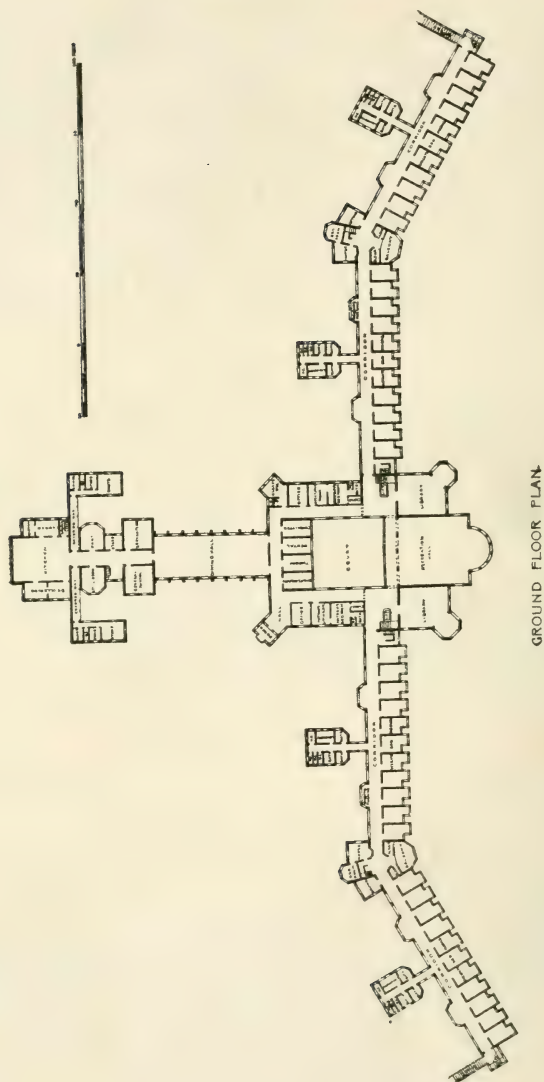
Dr. Latham's plan of King Edward VII. Sanatorium.
